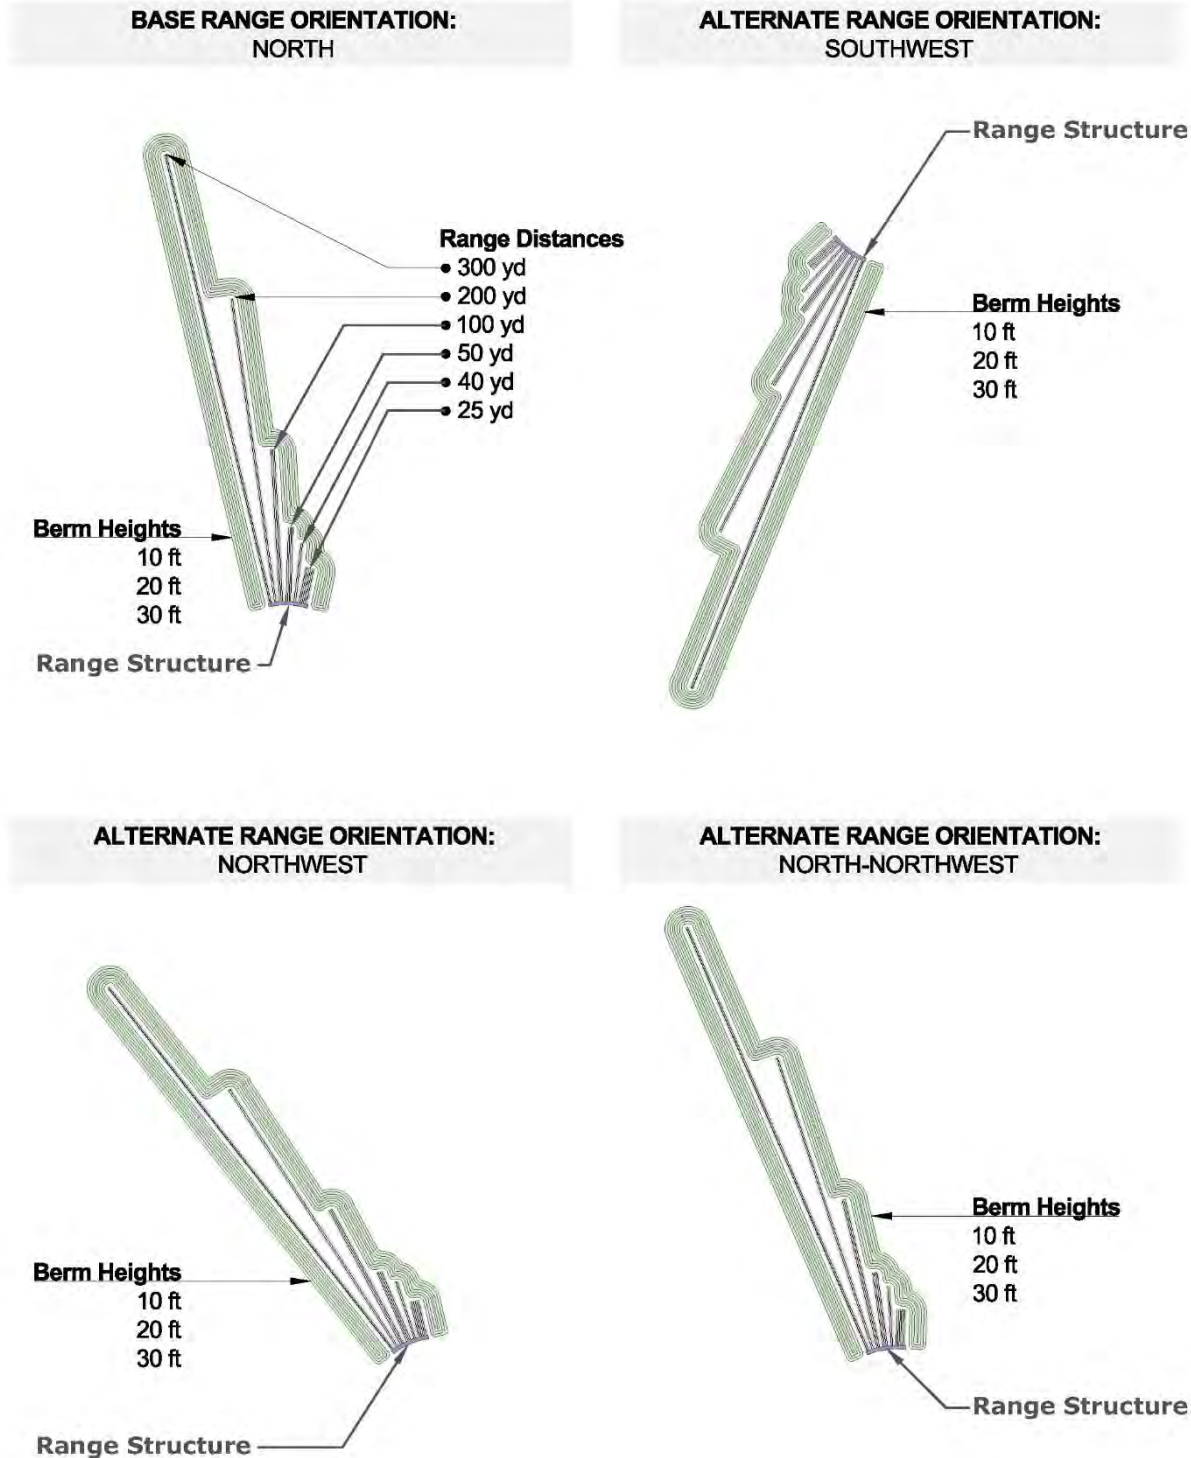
Concept plans showing the original and alternate range orientations for the 2 proposed range sites.
